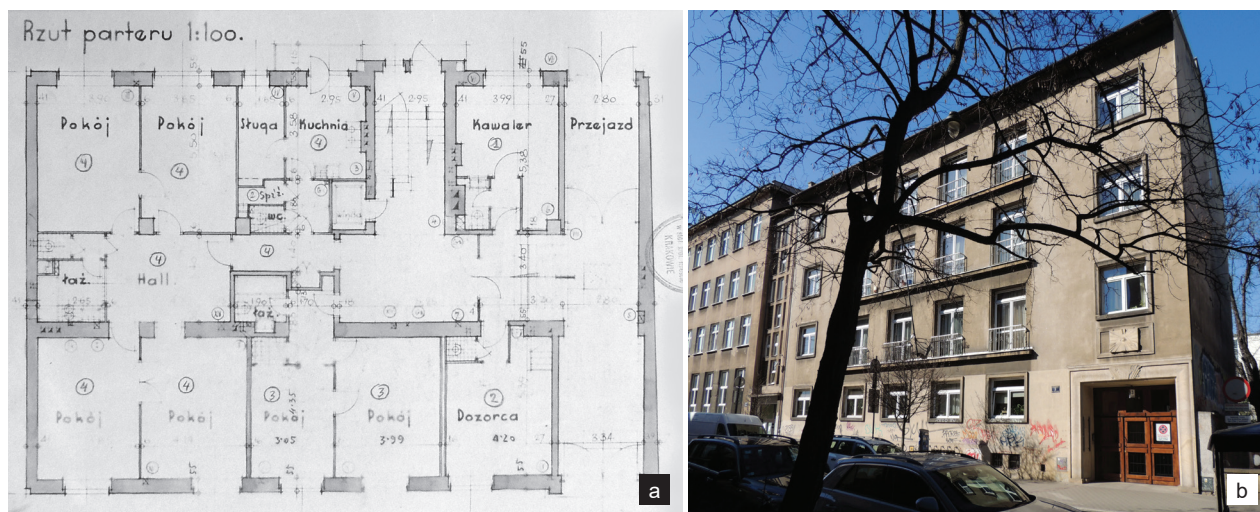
Tenement at 3 Smoleńsk Street: a) the ground floor plan (source: ANK, ABM, 3 Smoleńsk Street, ssc. 834), b) the tenement façade (photo by B. Makowska)
